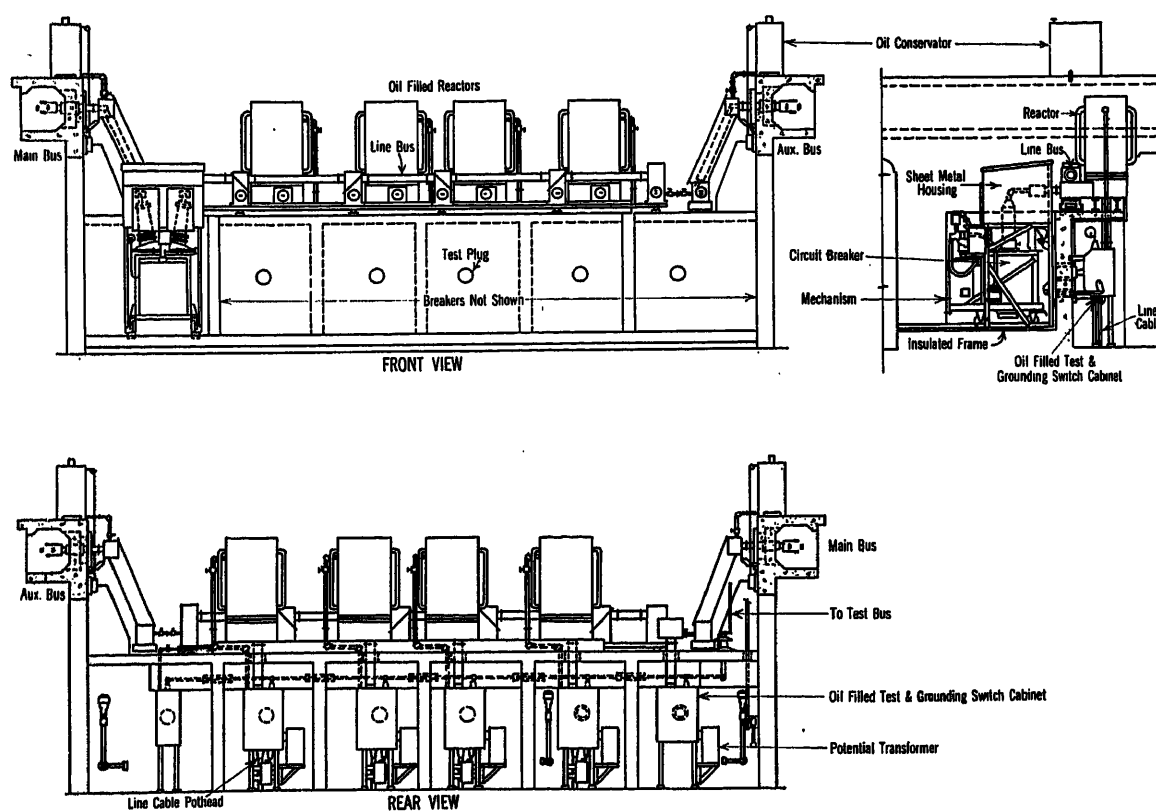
SECTION AND ELEVATIONS OF ONE PHASE OF 12-KV. METAL-CLAD, OIL-FILLED INSTALLATION
